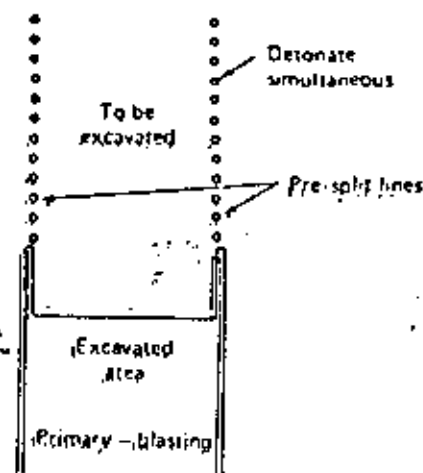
Typical layout for presplit holes. (After DuPont Blasters Handbook, 1966)
